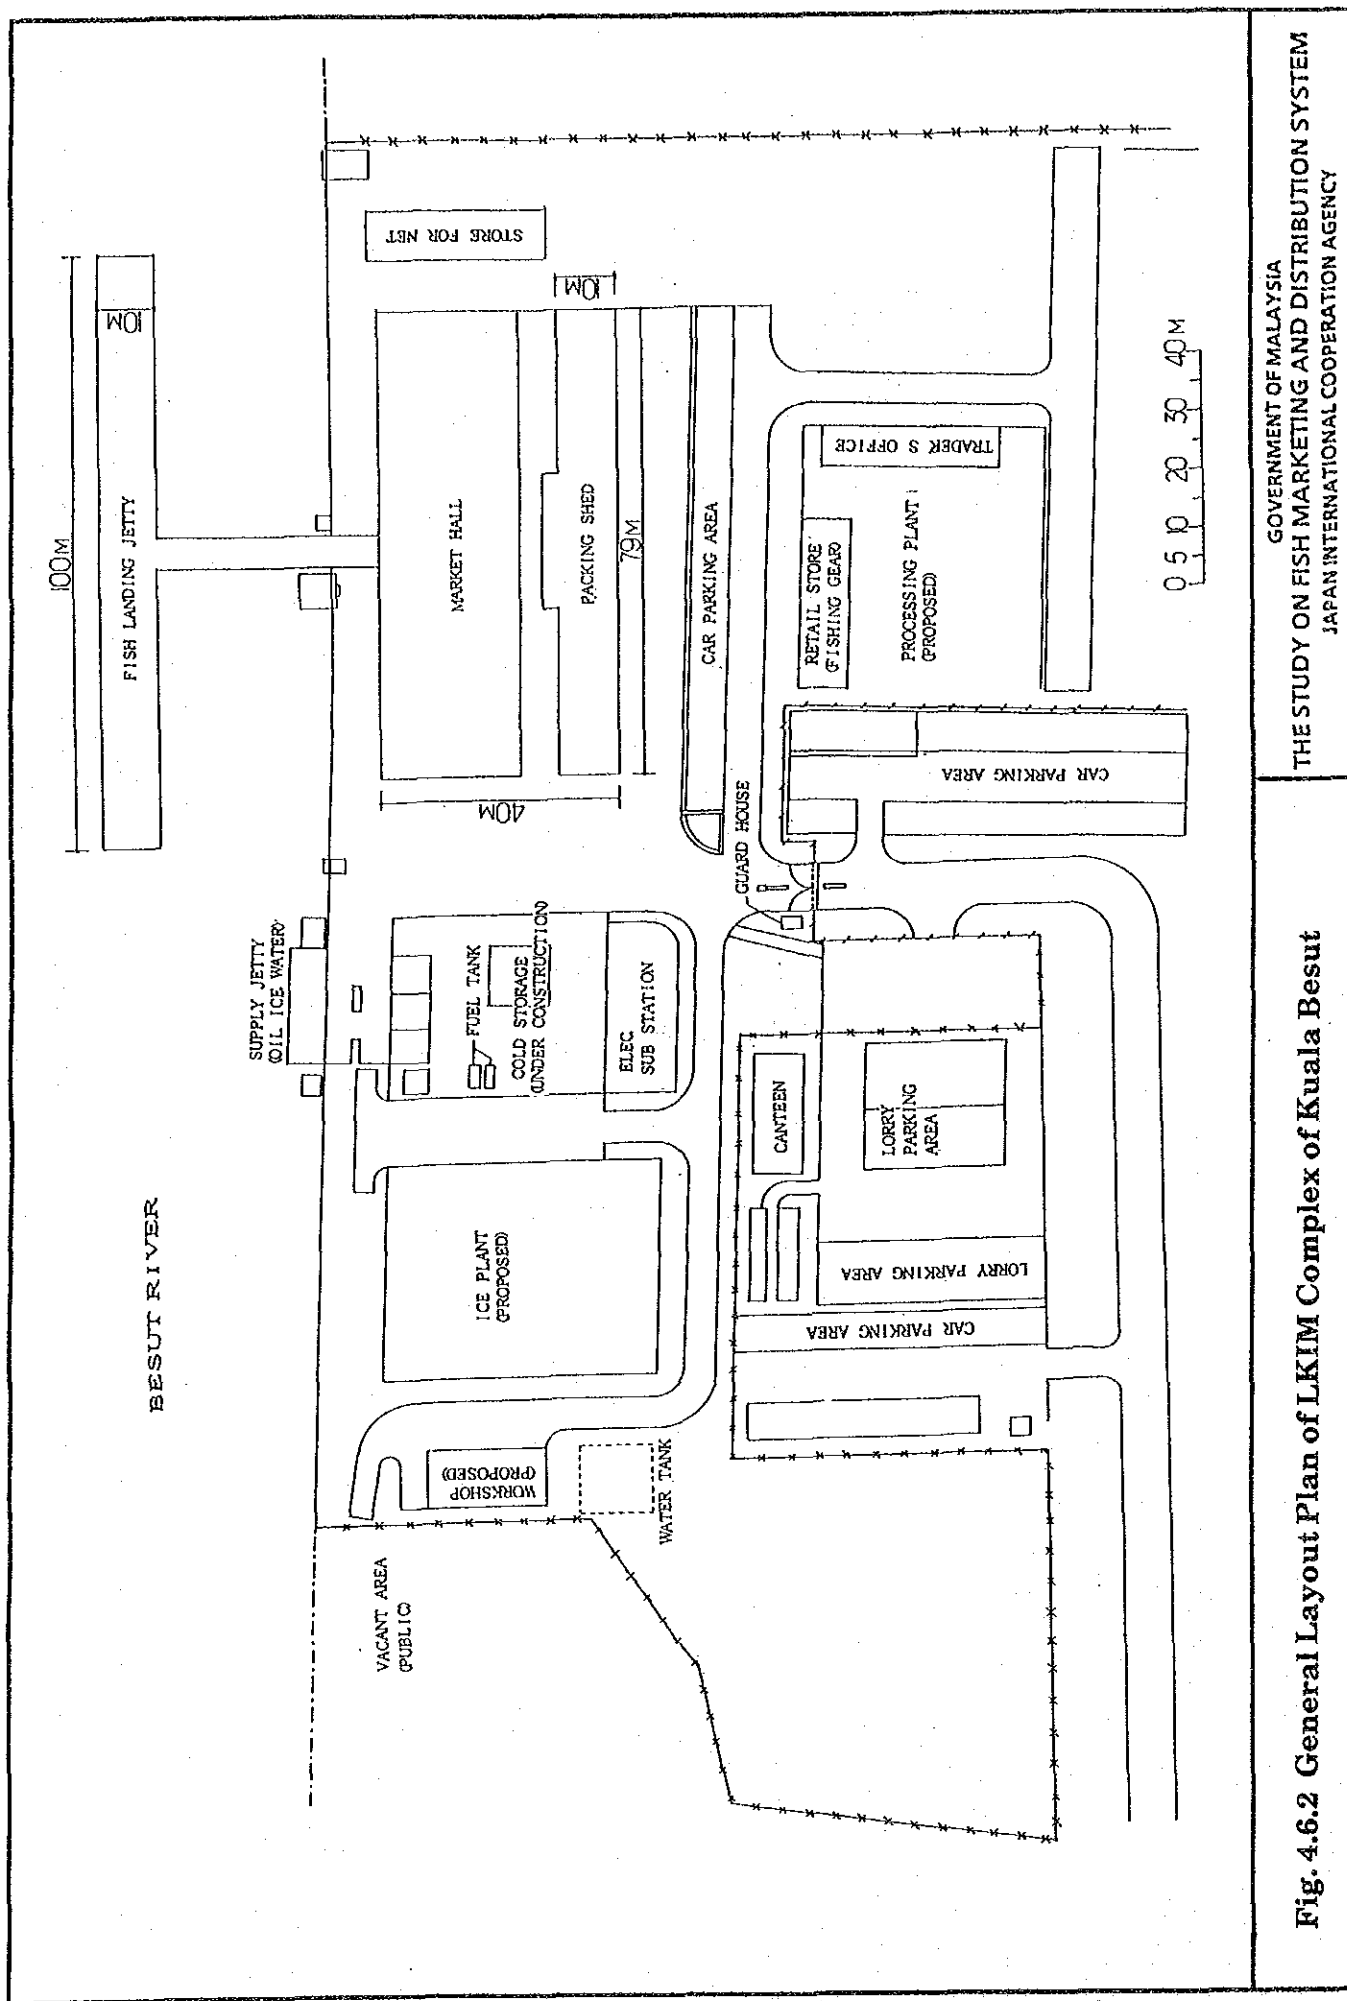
General Layout Plan of LKIM Complex of Kuala Besut
